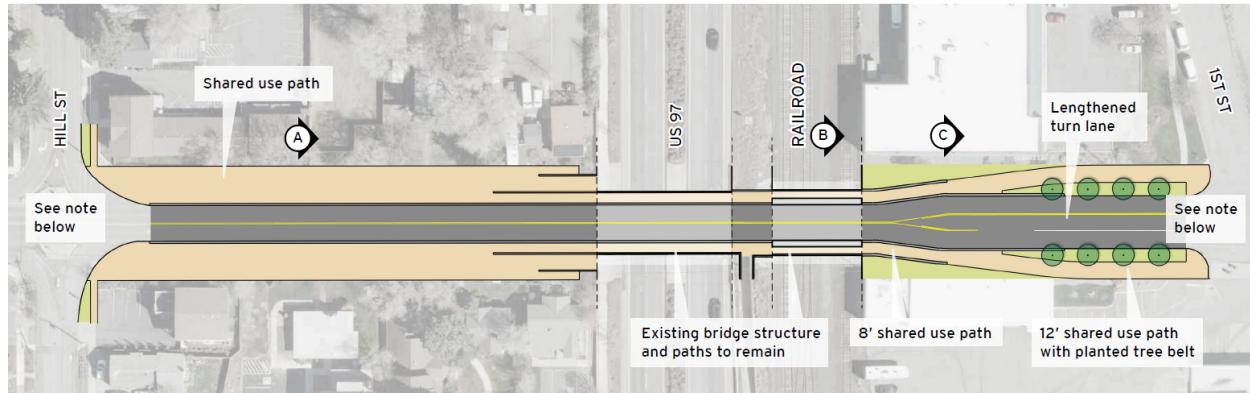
Franklin Avenue Concept 1: Widen and Level East Access – Plaza
